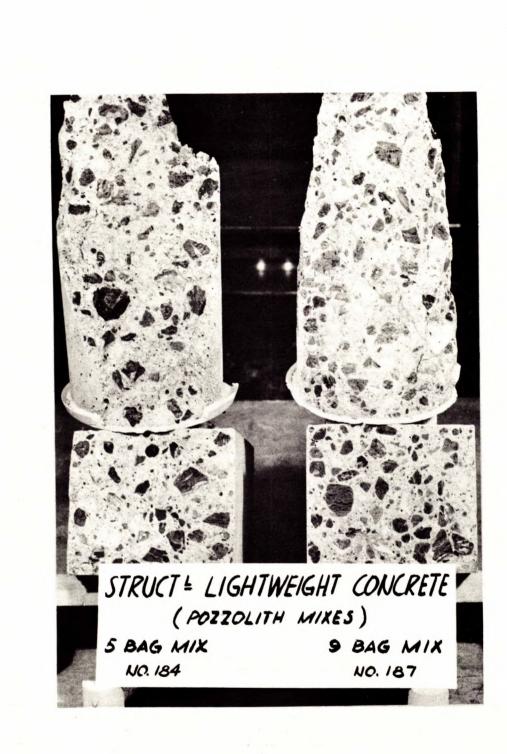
Broken test specimens from Series 2. Beam fractures are shown in the lower row, cylinder fractures in the upper row.
